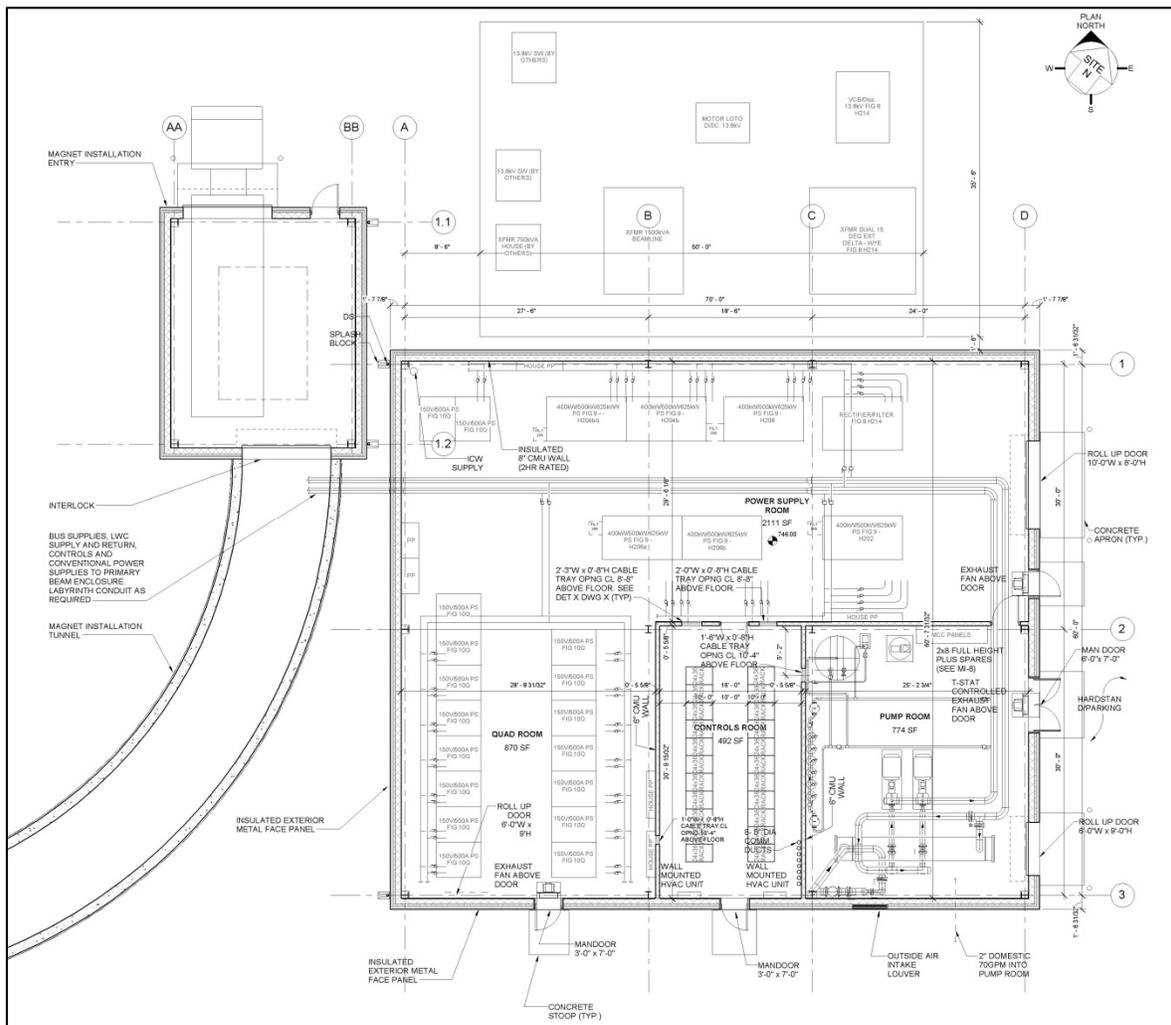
Primary Beam Service Building (LBNF-5) Floor Plan
